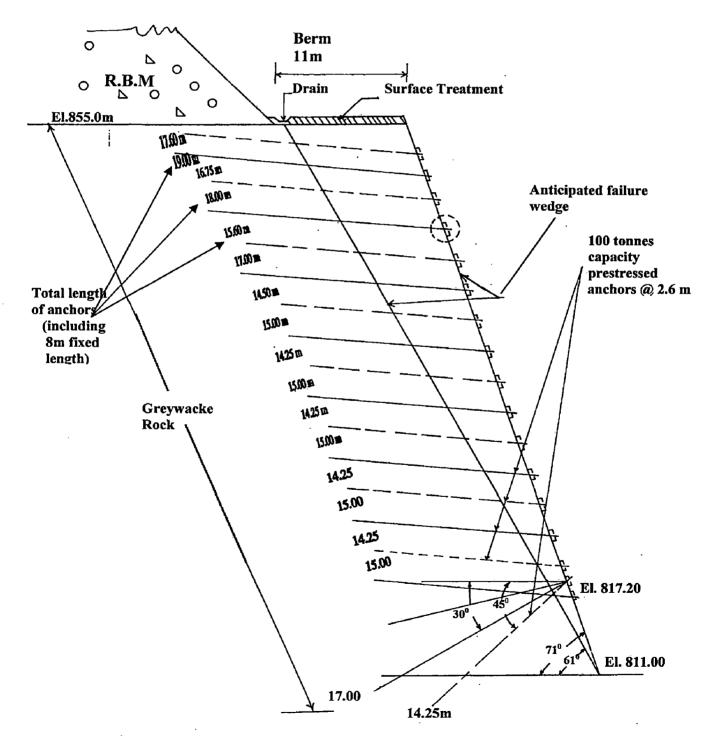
Section showing prestressed anchors (wedge failure case)
